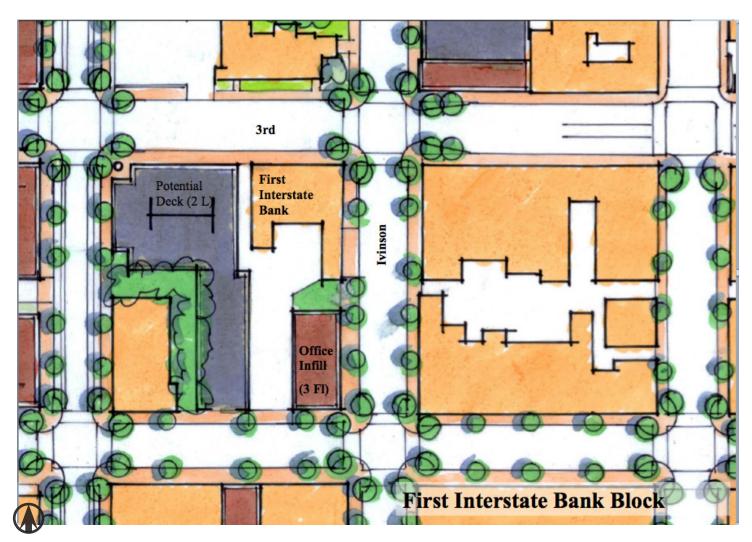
Detail plan illustrating potential expansion /infill development and a parking deck on the First Interstate Bank Block.
